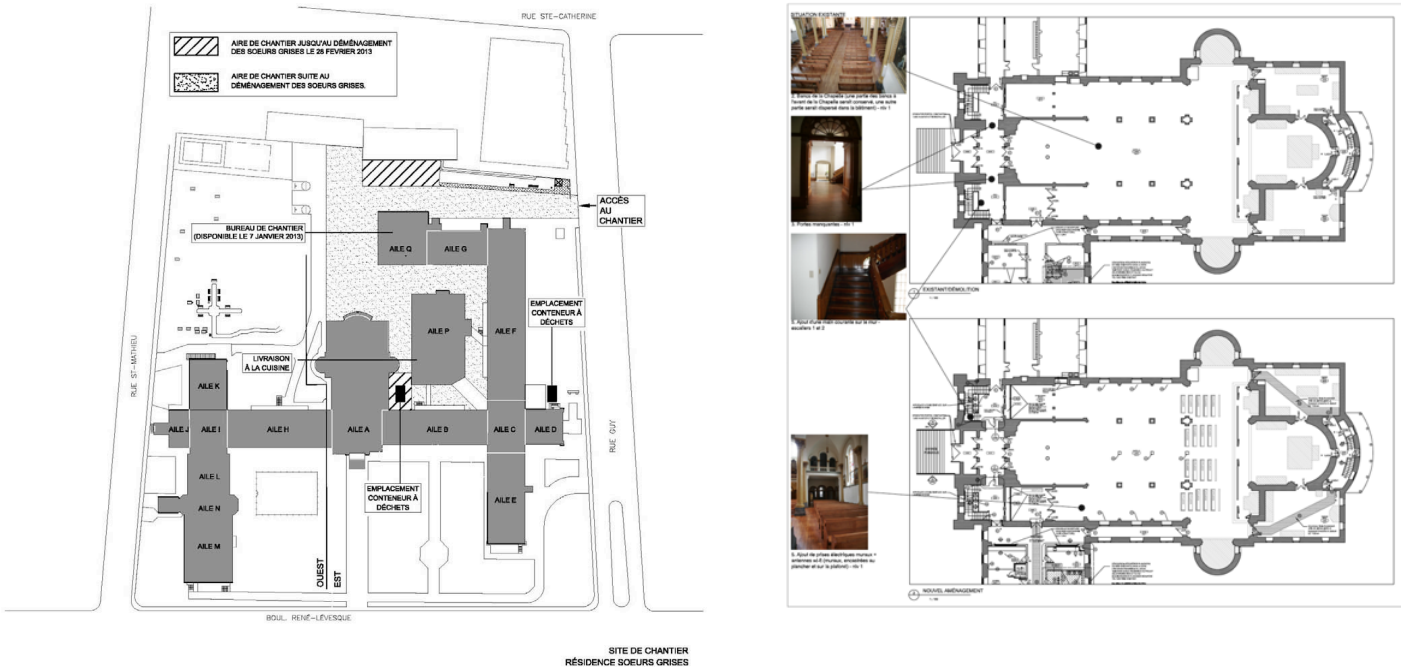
Grey Nuns Building, Canada (Facility Management Department, 2019)
